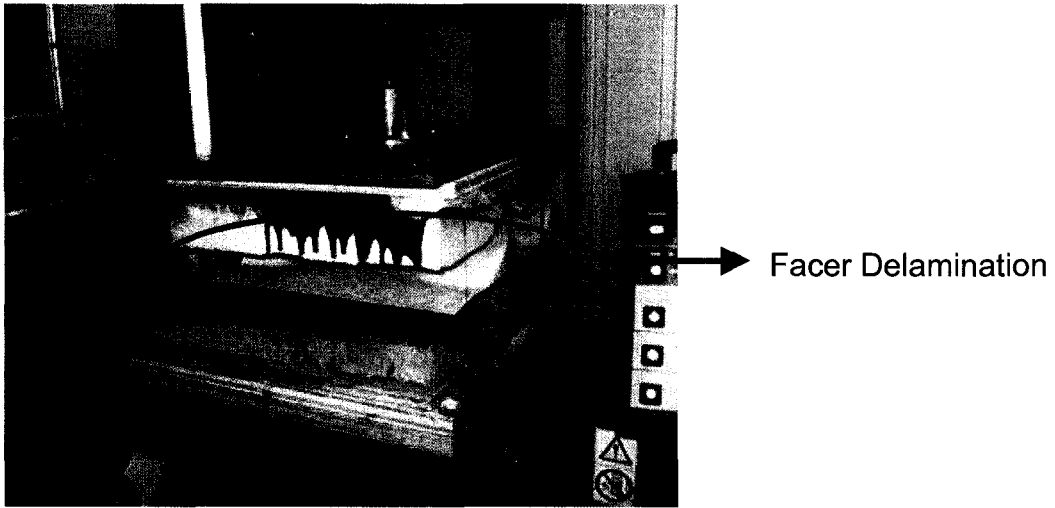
Source 1 concrete deck specimen failure
